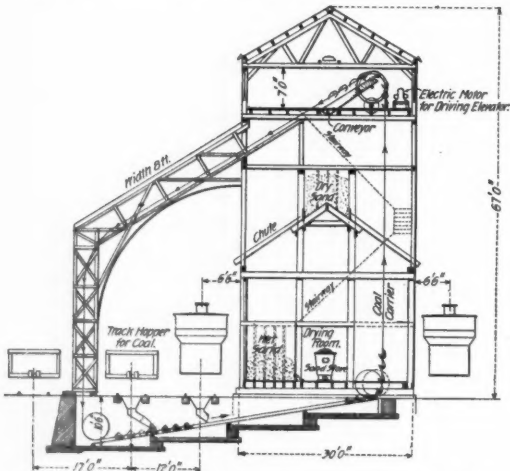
End Elevation of Coaling Station—Looking from East.
